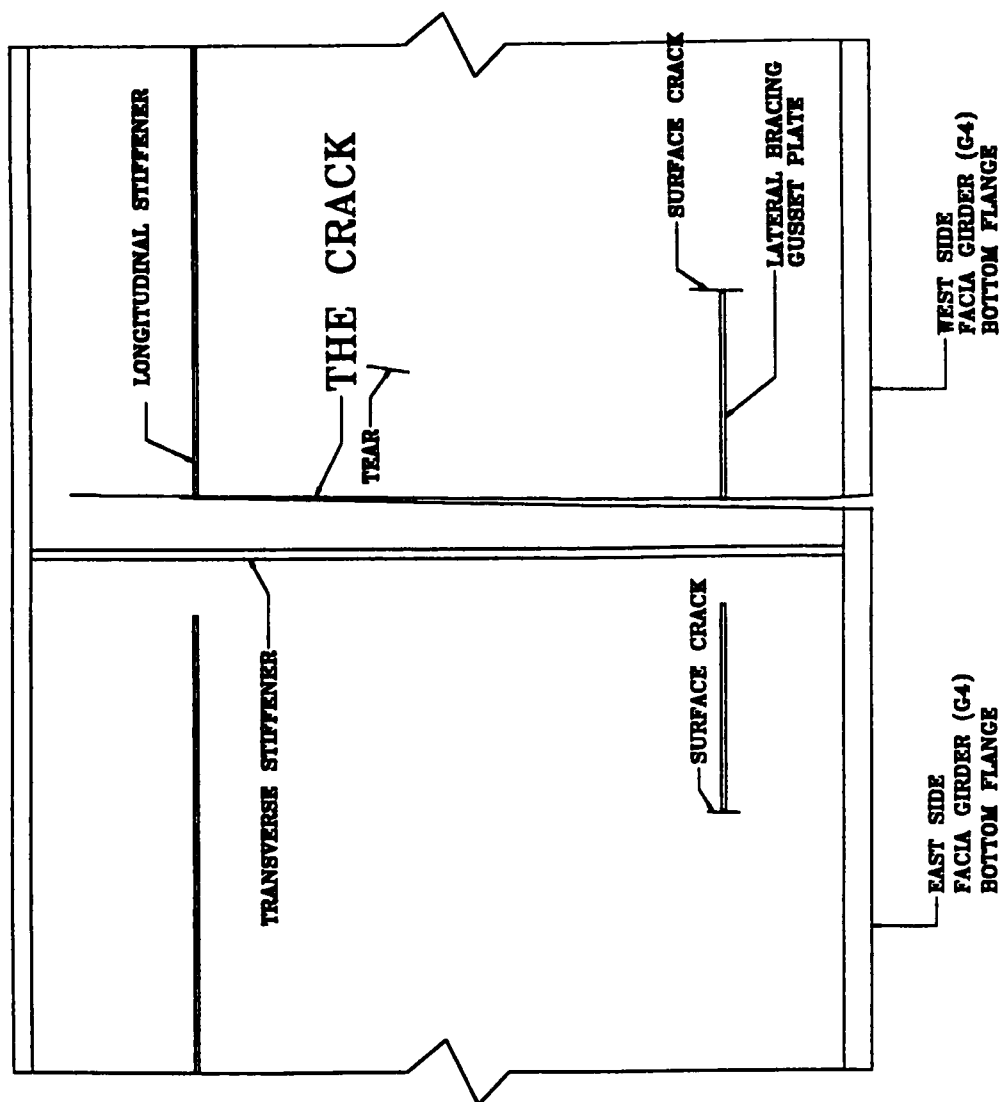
Elevation view of the eastbound fascia girder showing the failure.
